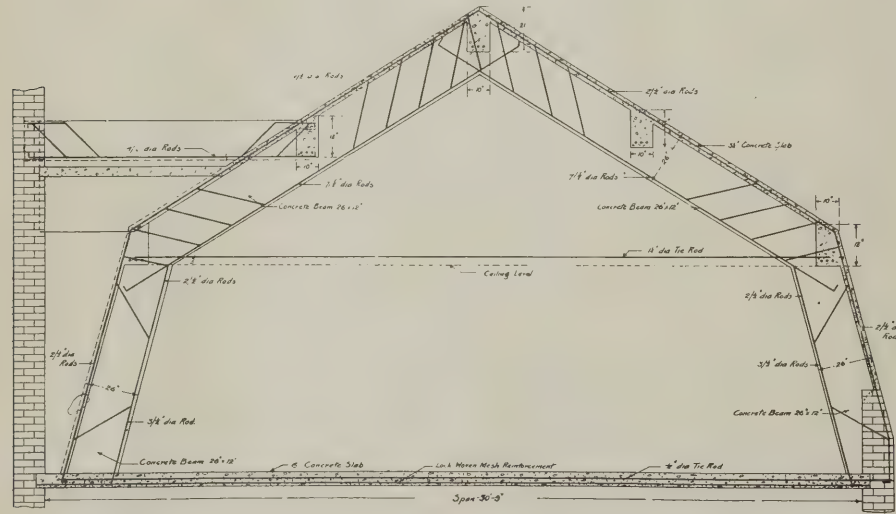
DETAIL OF MANSARD ROOF, ST. ANNE'S VESTRY HALL, SOHO, LONDON.
